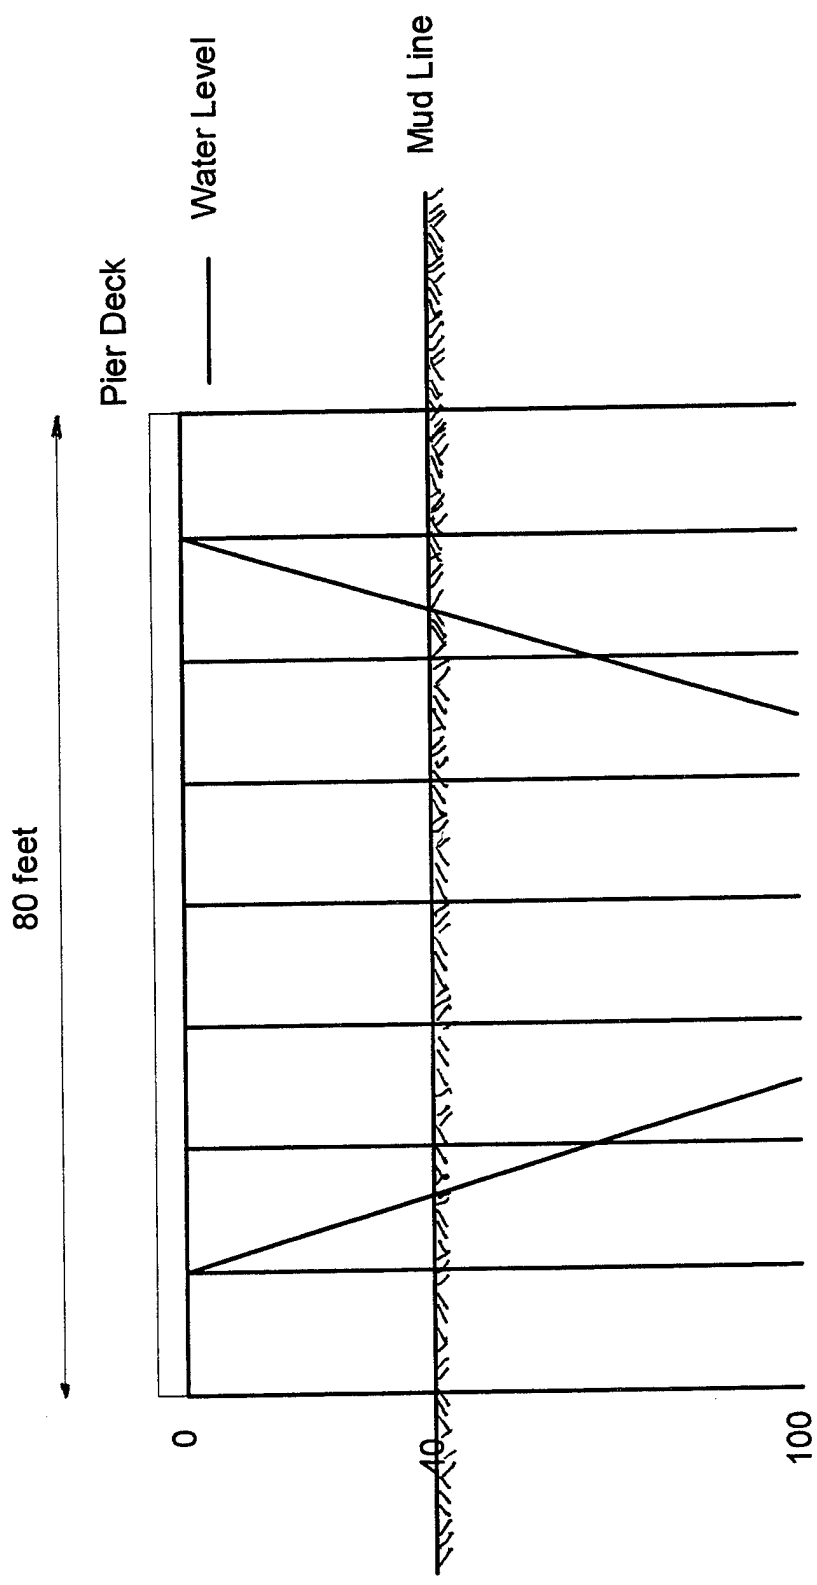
Typical pier with batter piles used in 2-dimensional analysis.
